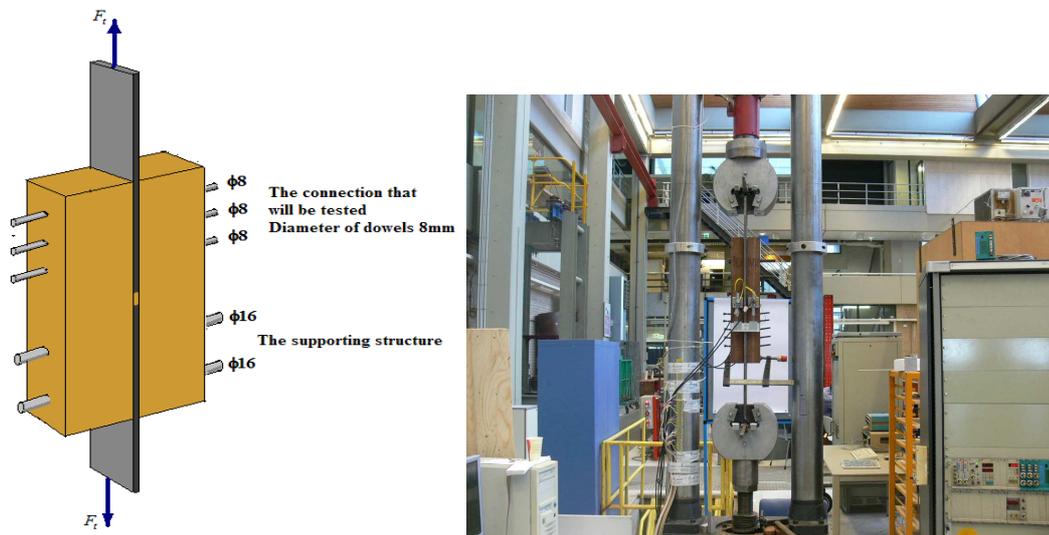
The test specimen and the testing machine with the test specimen mounted on it
